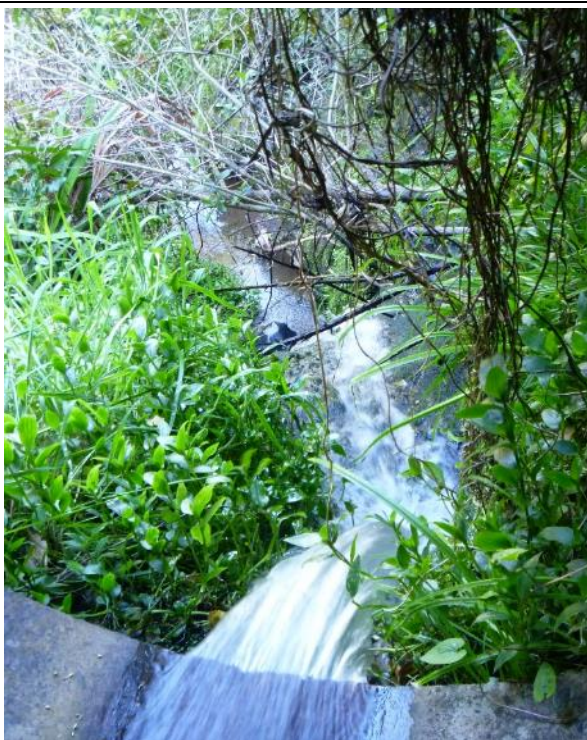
Fish Barriers: Stream B at the Liverton road crossing below the site is a significant perched culvert and waterfall
